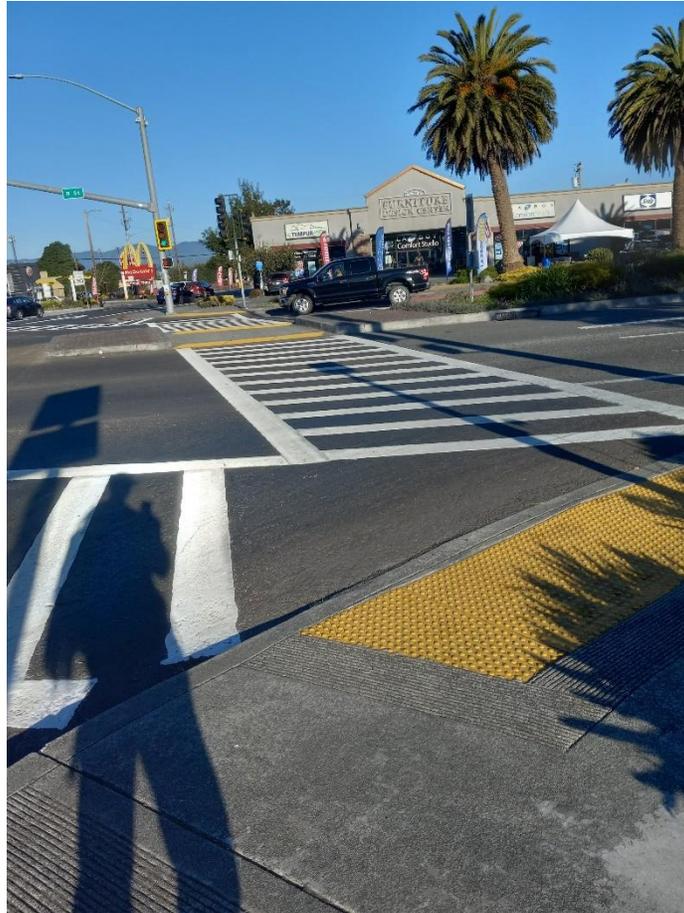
5th and R Streets, featuring a very long crosswalk and a wide vehicle right-turn radius with a misaligned curb ramp.
